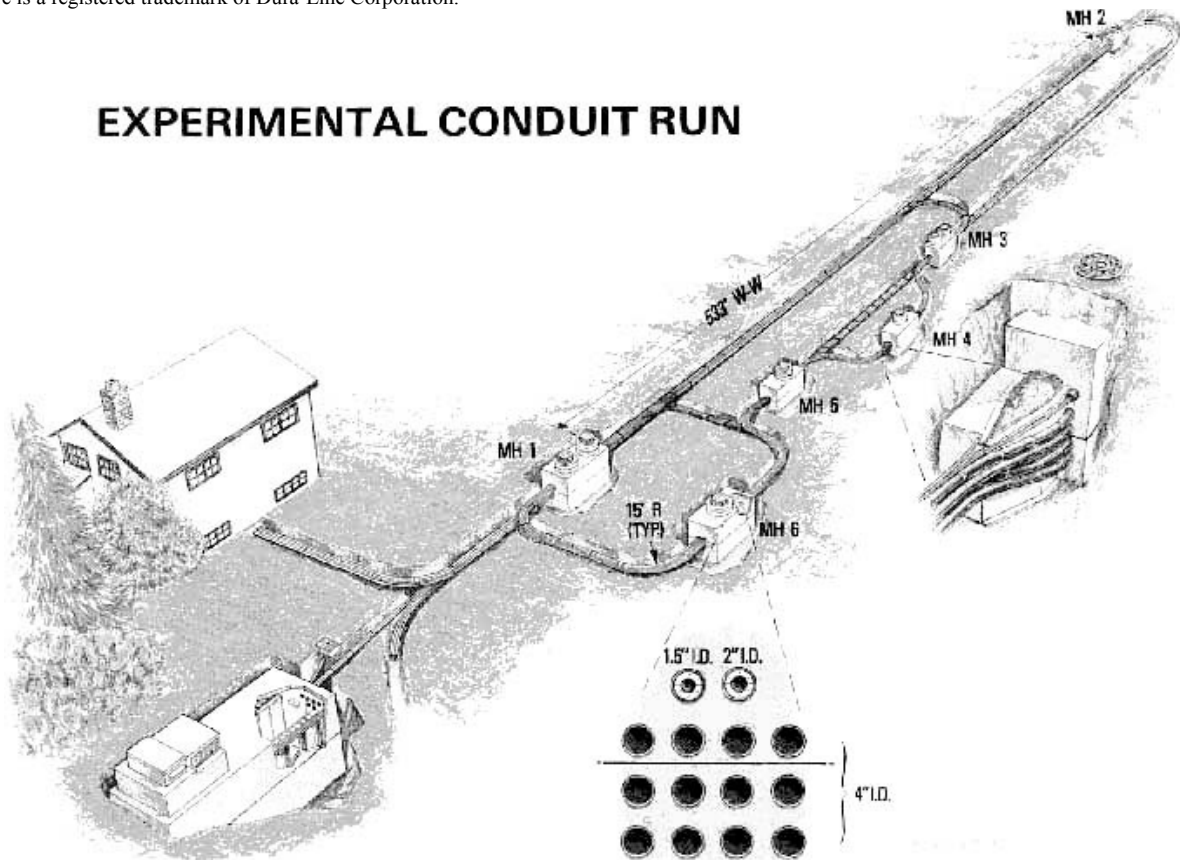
Underground Conduit Facility Used for the Cable Blowing Tests
